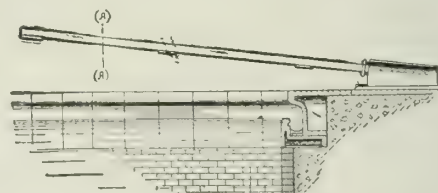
WOOD SPRINGBOARD AND ADJUSTABLE METAL HOLDER
